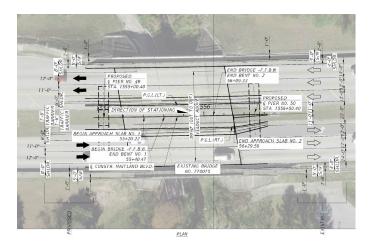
SR 414 Over Little Wekiva River Bridge (Plan View)
